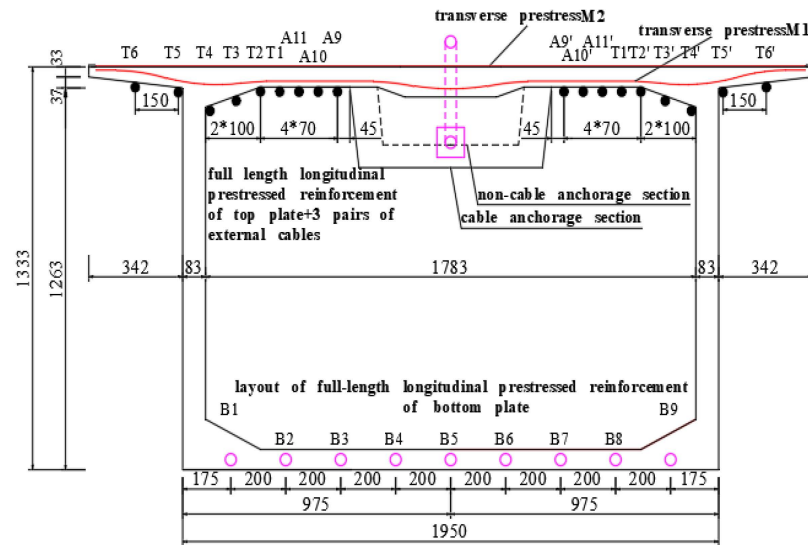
Cross-sectional layout of the longitudinal pre-stressed reinforcement for the full length of the top and bottom plates (unit: mm).
